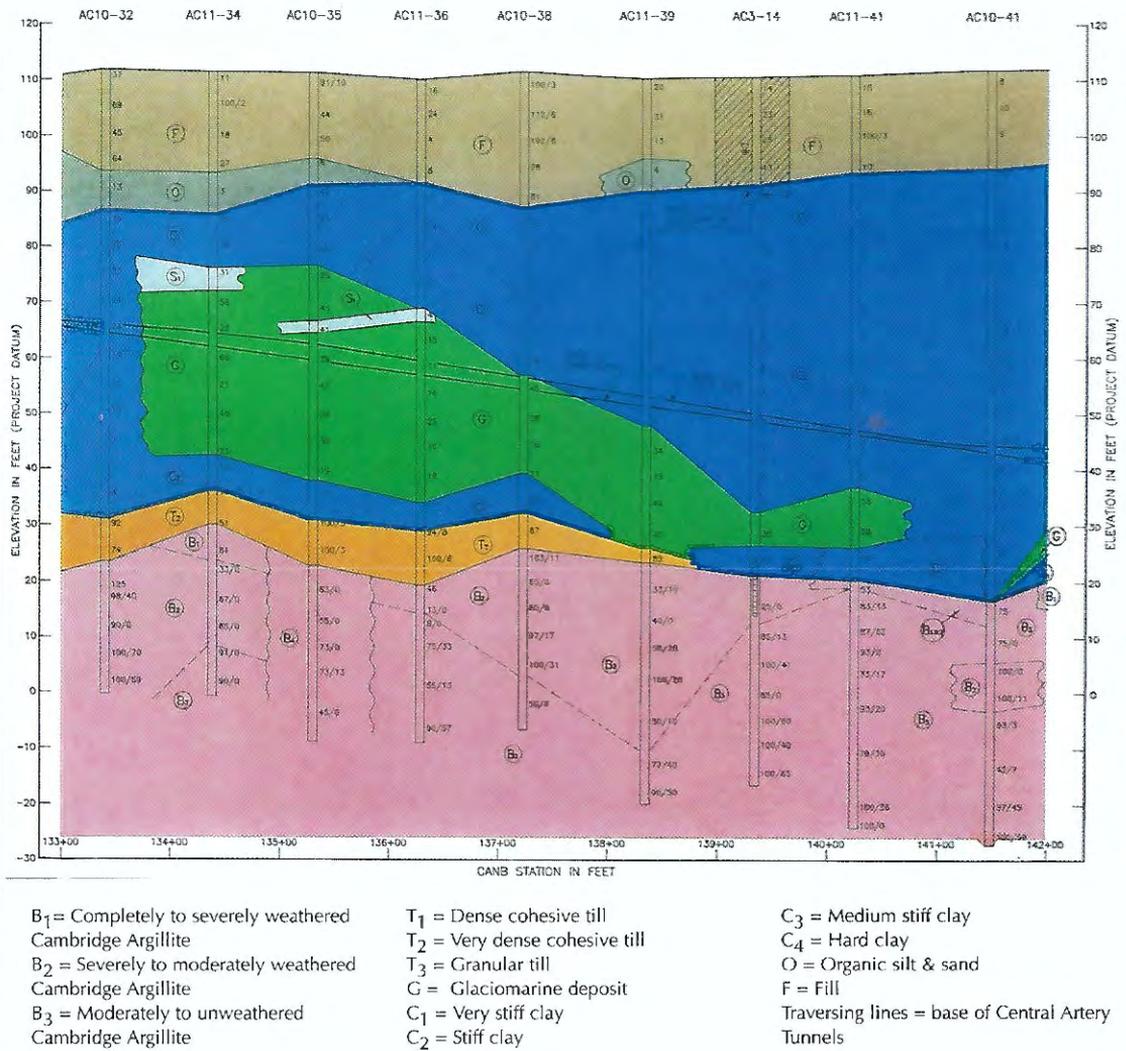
Section along the Central Artery Tunnel from Congress Street to Fleet Center near the Charles River, middle slurry wall between Stations 133+00 and 142+00 (view west to southwest).
